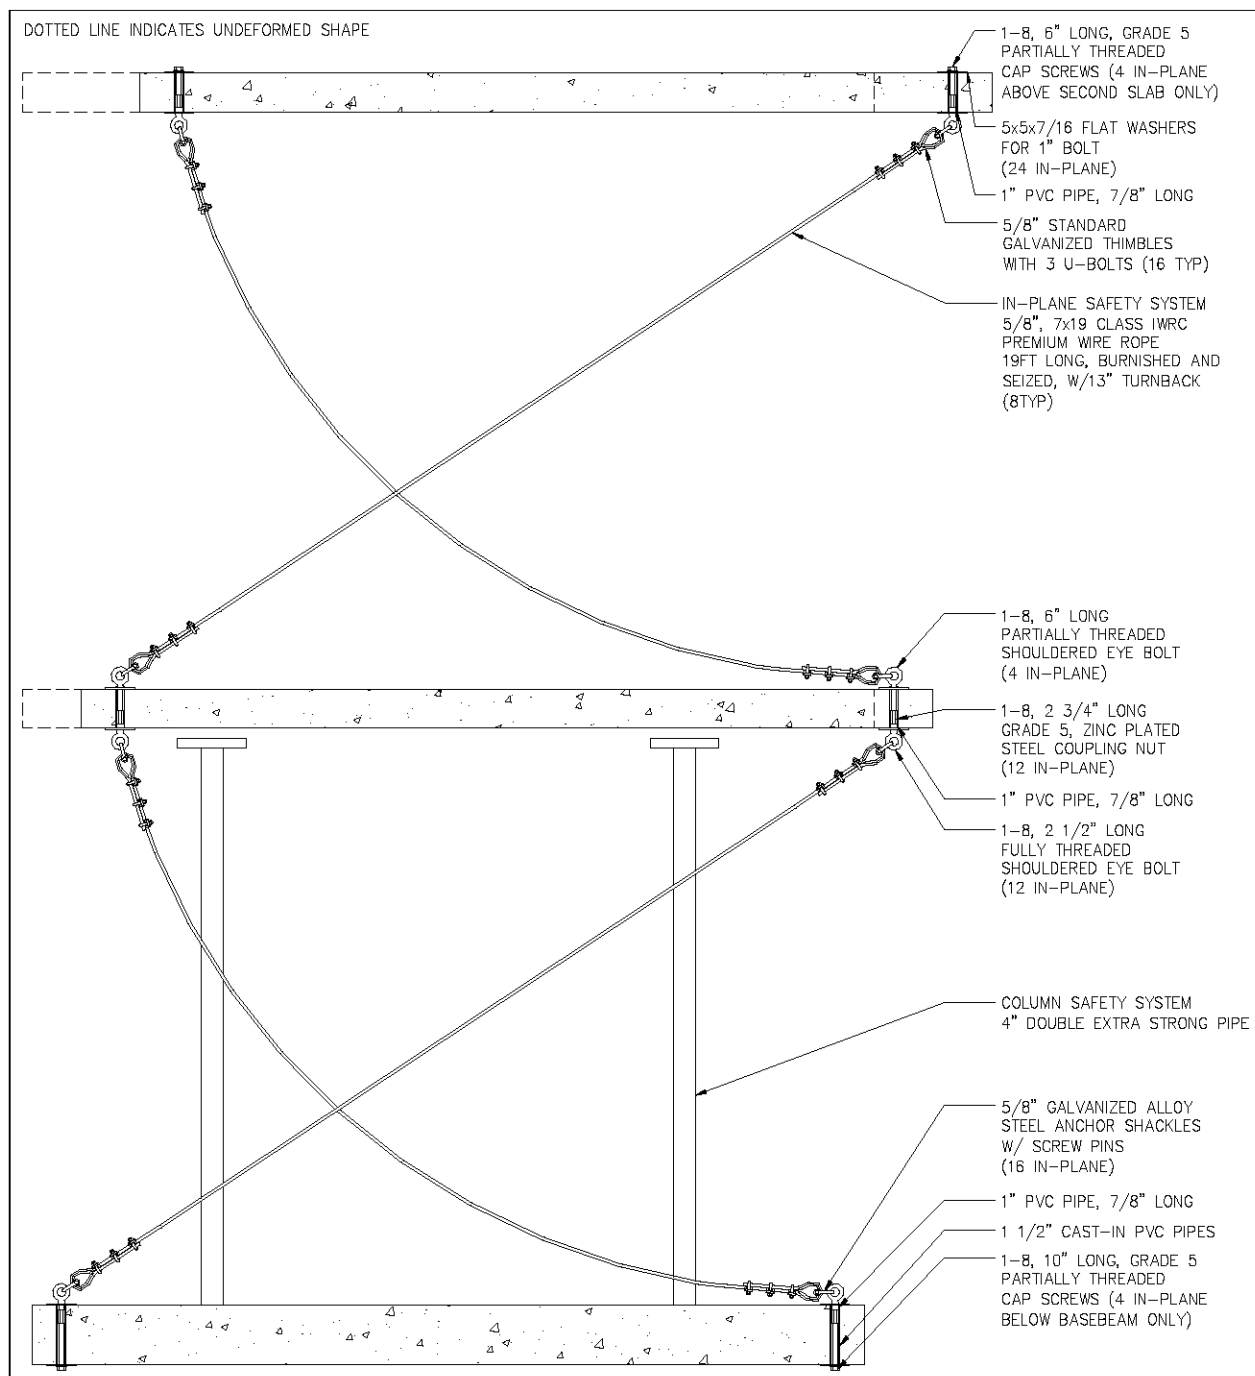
In-plane elevation view showing the floor slabs with safety cables (shear panels and weights not shown).
